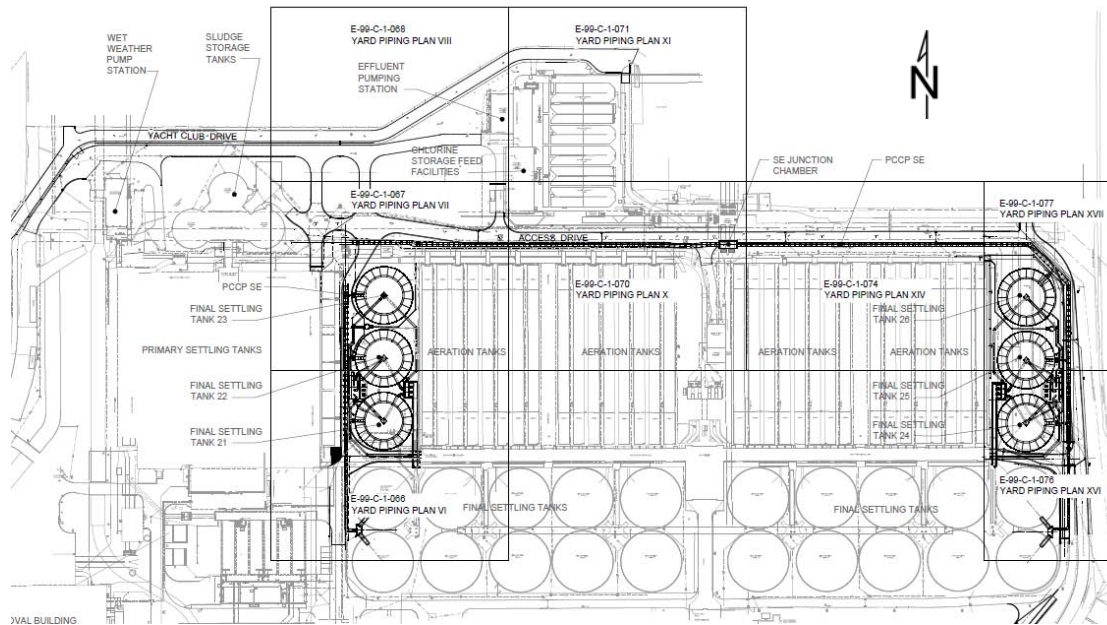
Proposed Easterly Wastewater Treatment Facility Secondary System Improvements – Cleveland, Ohio
